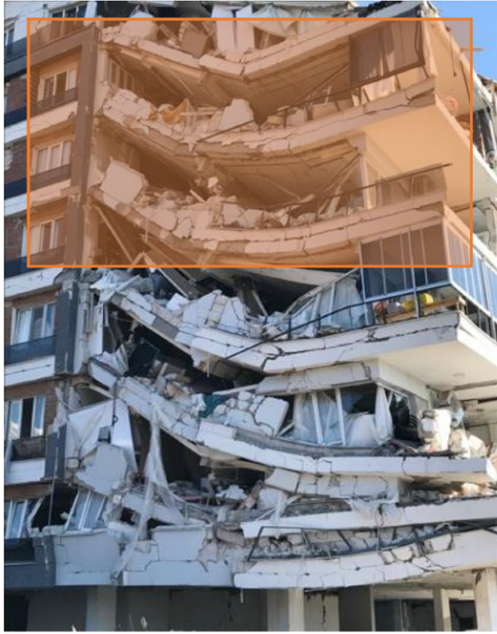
Earthquake-damaged reinforced concrete building.
